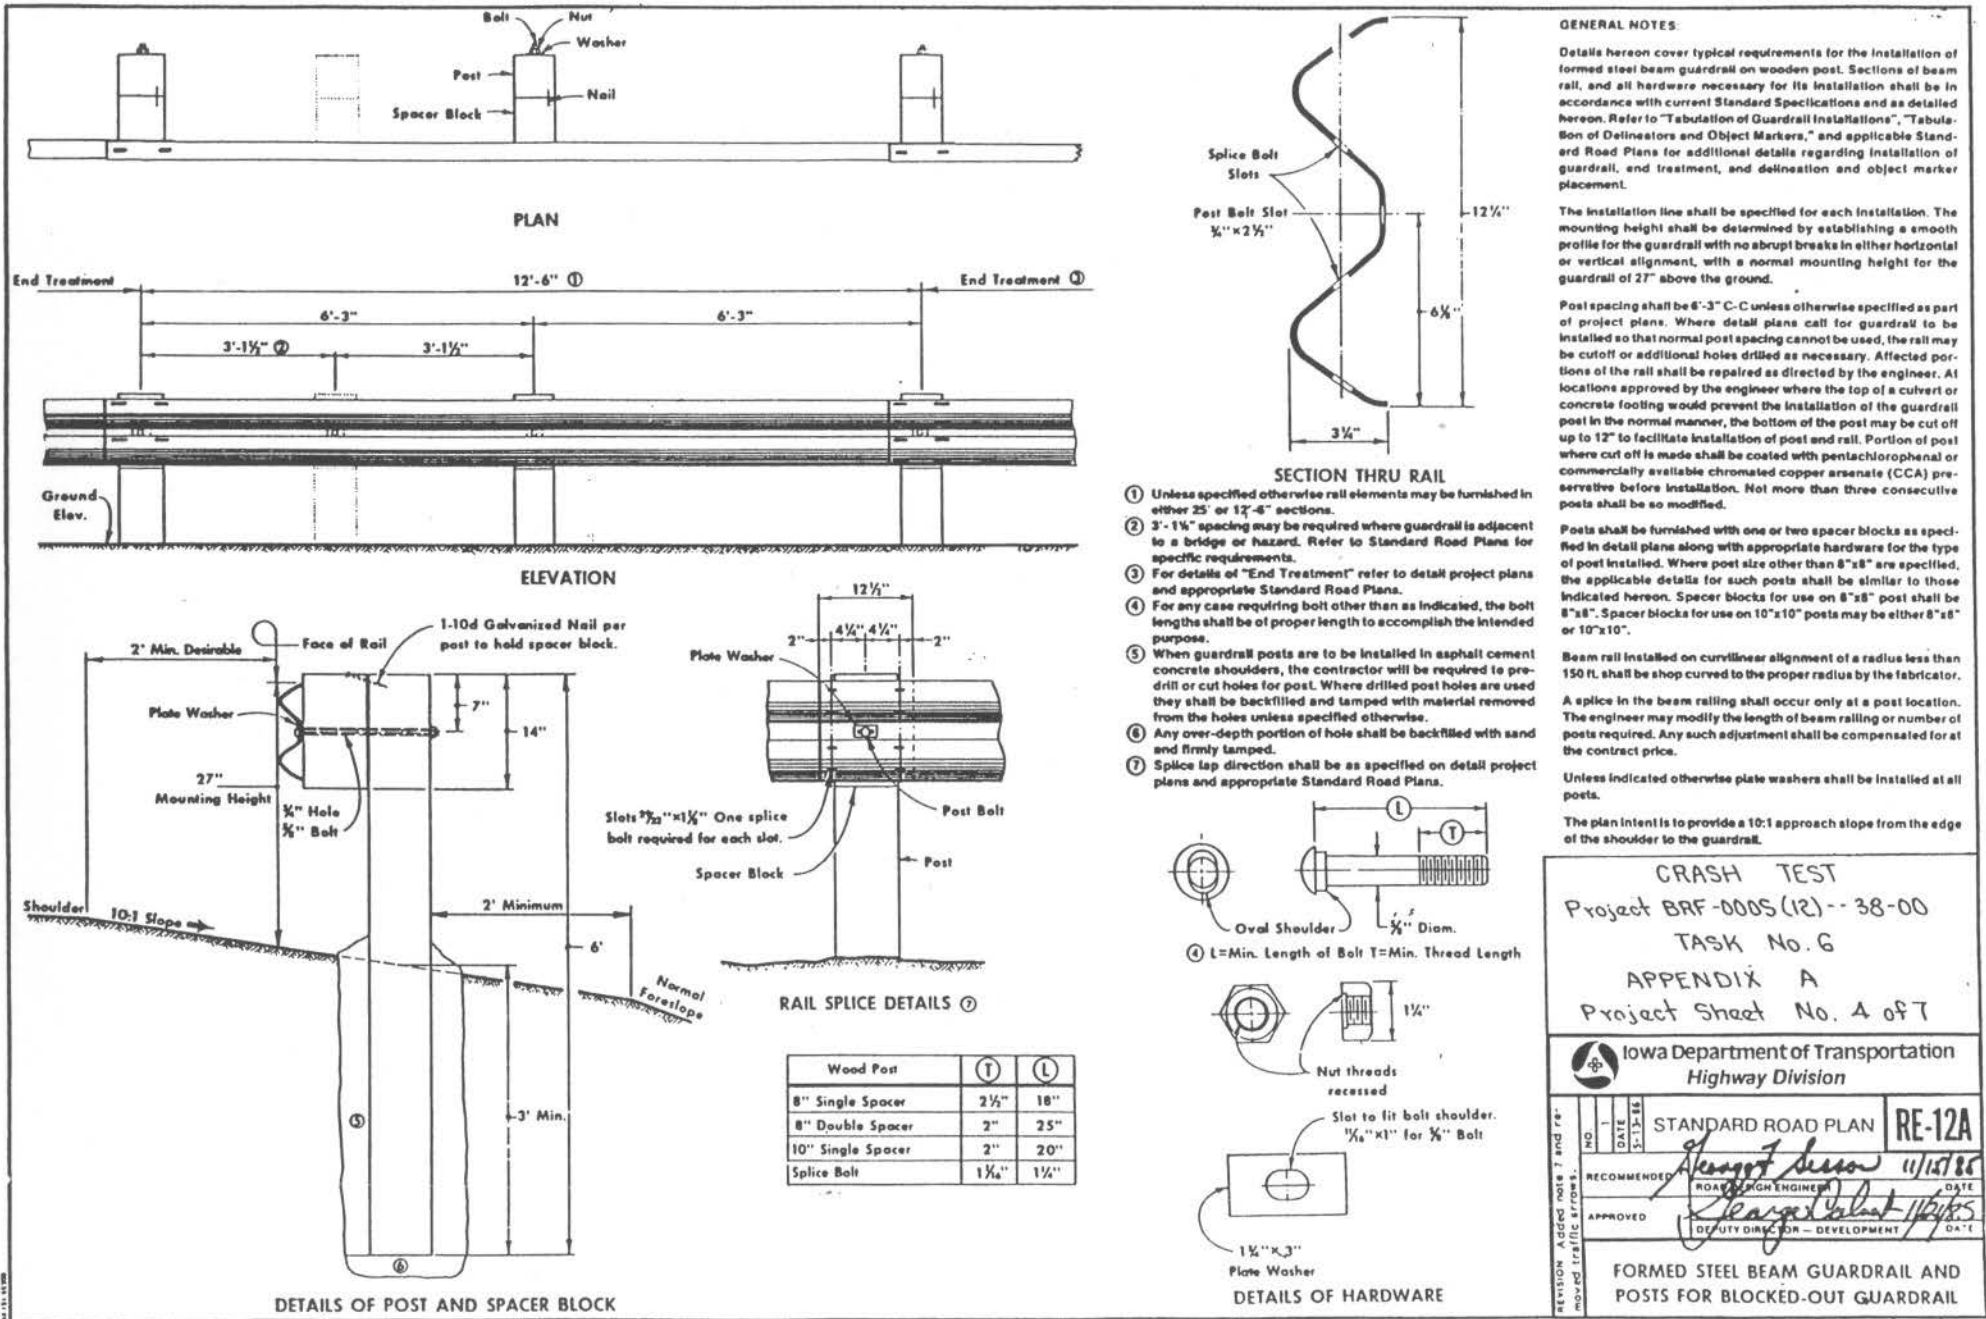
SKETCH OF GUARDRAIL TO POST ATTACHMENT.
